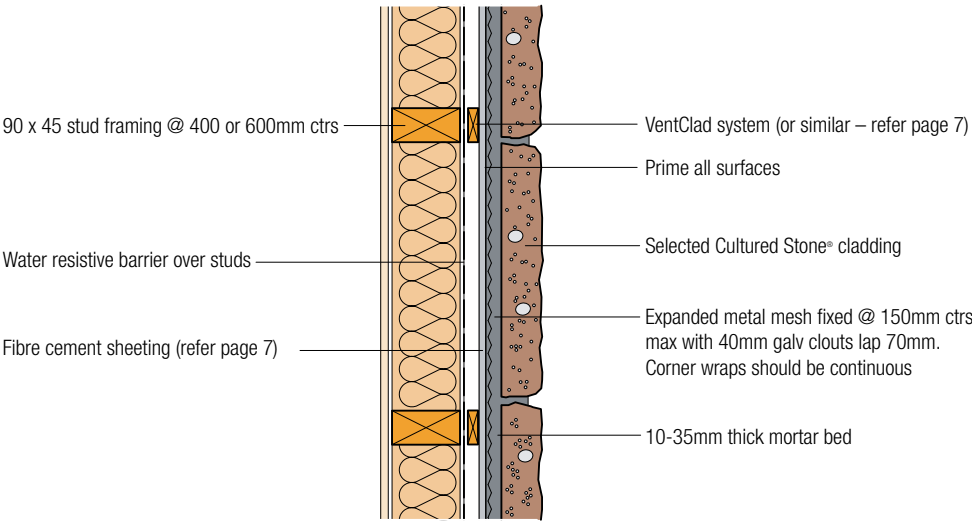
Fibre Cement Clad - Plan (Dwg # CS-03.01)
